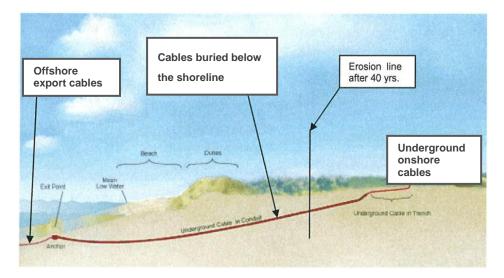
Typical landfall cable arrangement (not to scale) (Courtesy ABB)
